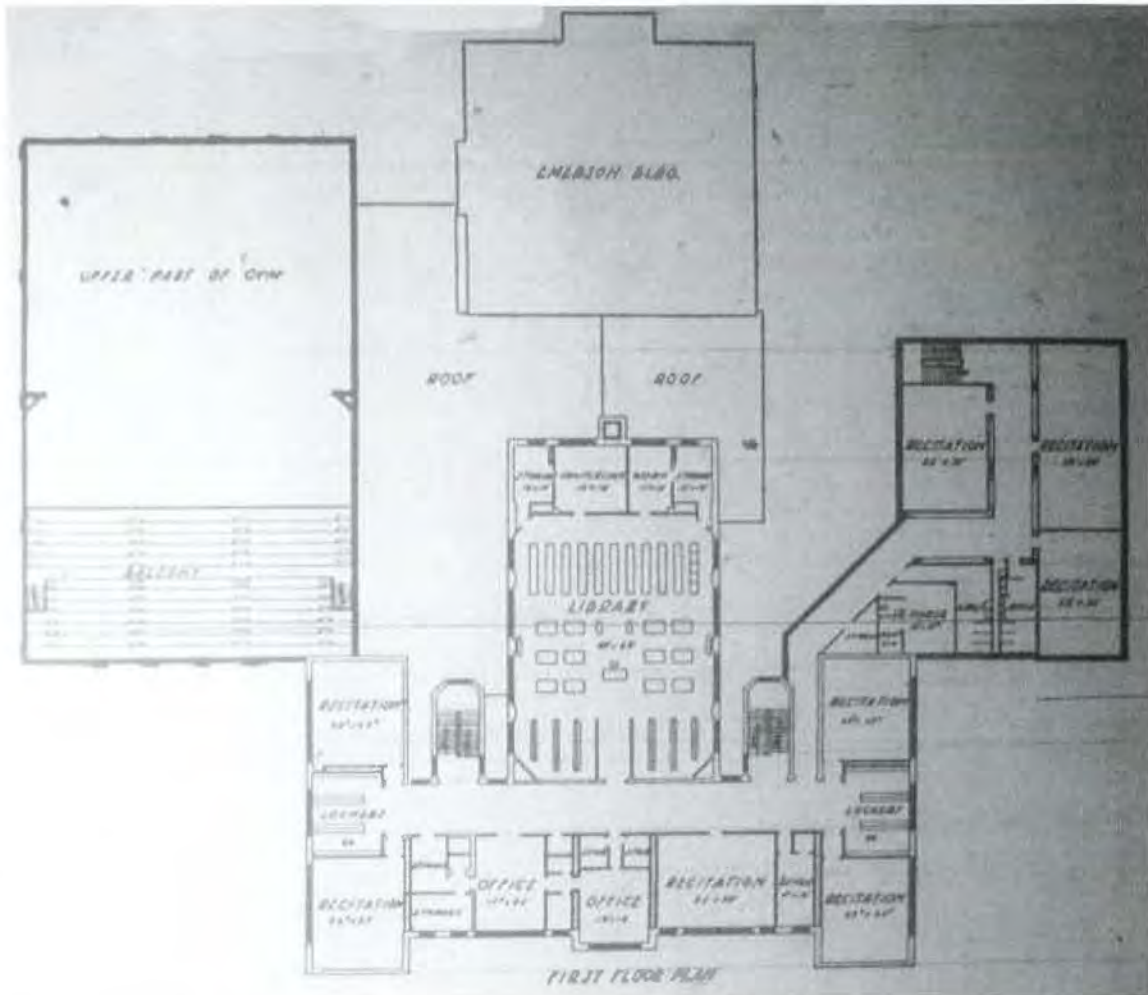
New Ulm High School, Second Floor, 1939 (First floor in 1939 plans)
